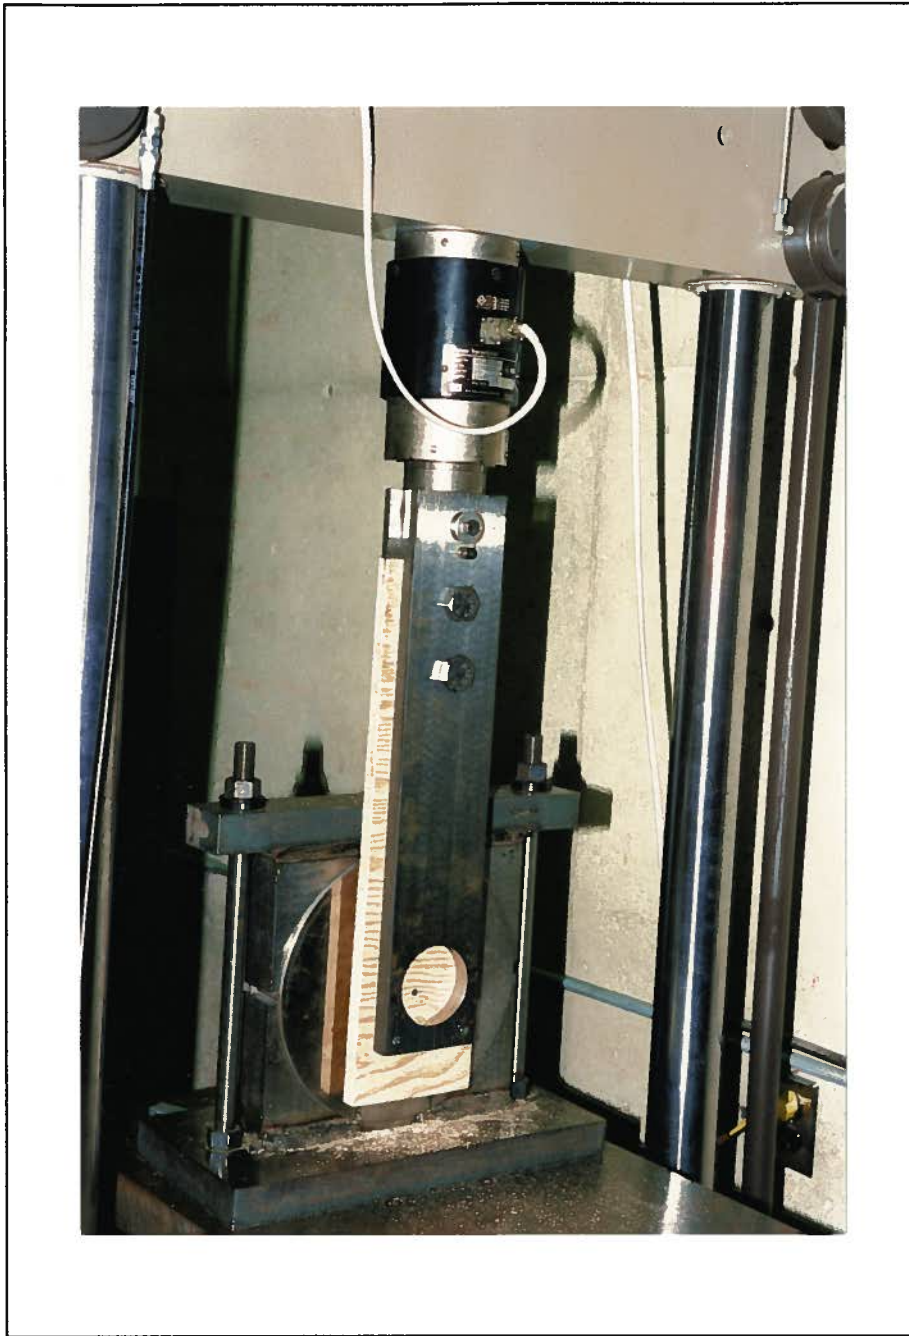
Test setup for testing the joist/plywood connection in shear; front view
